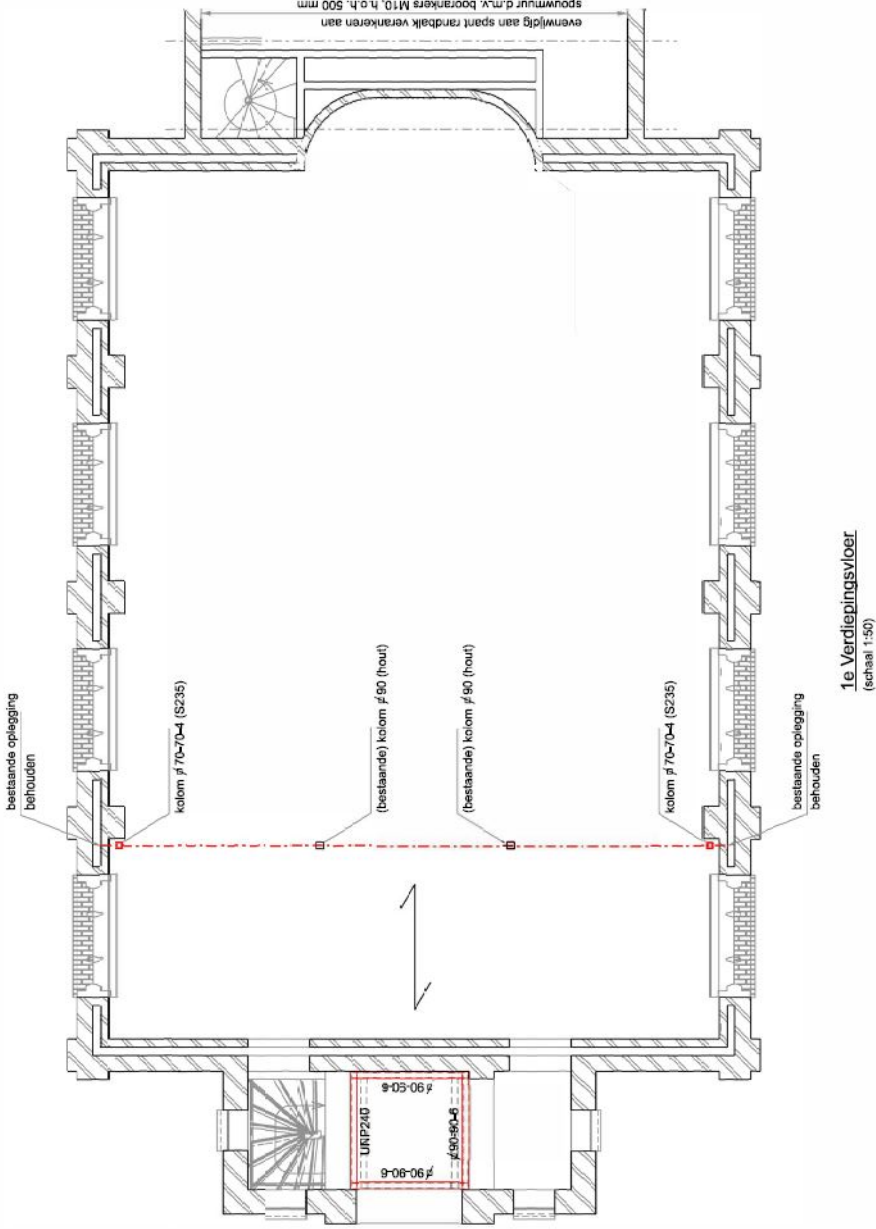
Floor Plan of the case study - indicating the cavity walls in both facade and lateral walls, placement of new Timber columns & steel frame
